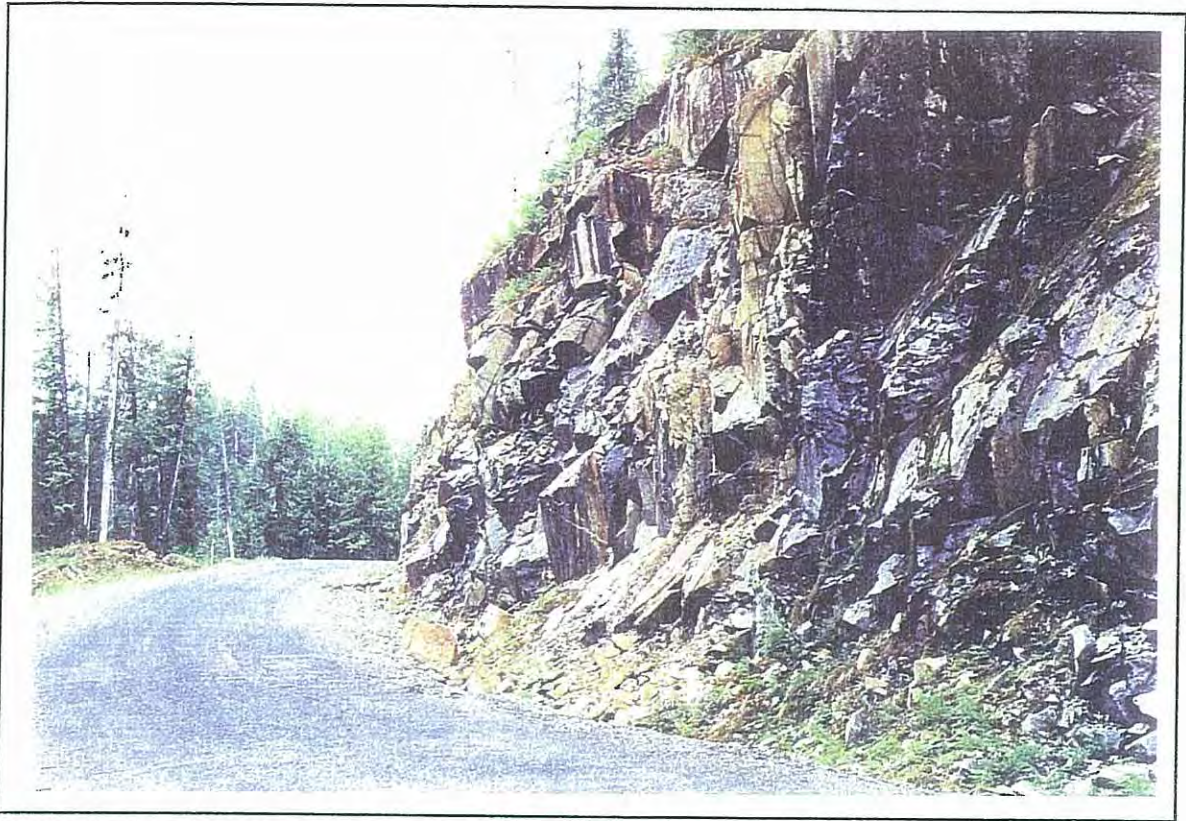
Another outcrop of extremely fractured phyllite with planar joints inclined toward roadway (right side of photo).
